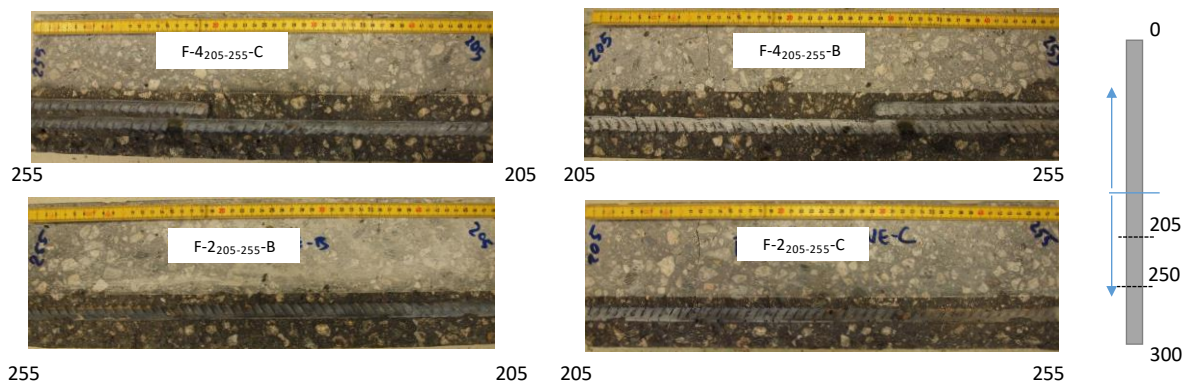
Steel-concrete interface of beam F section 205 to 255 cm. White precipitate at the cracks and spread over the steel-concrete interface. Superficial rust
